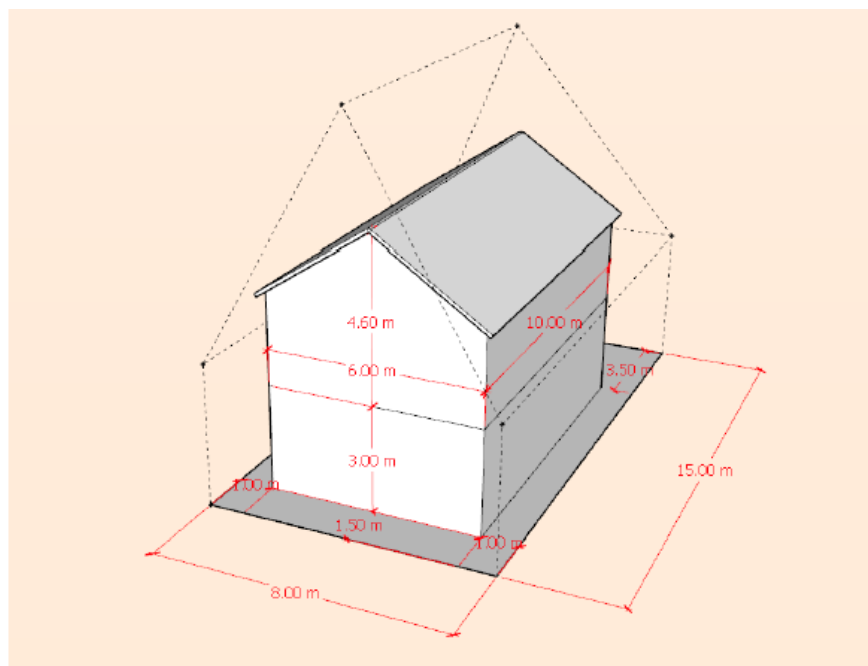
Modelled permitted building envelope within a flat 8m x 15m site. In this example it has been assumed no parking is provided as-prescribed by the NPS-UD.
